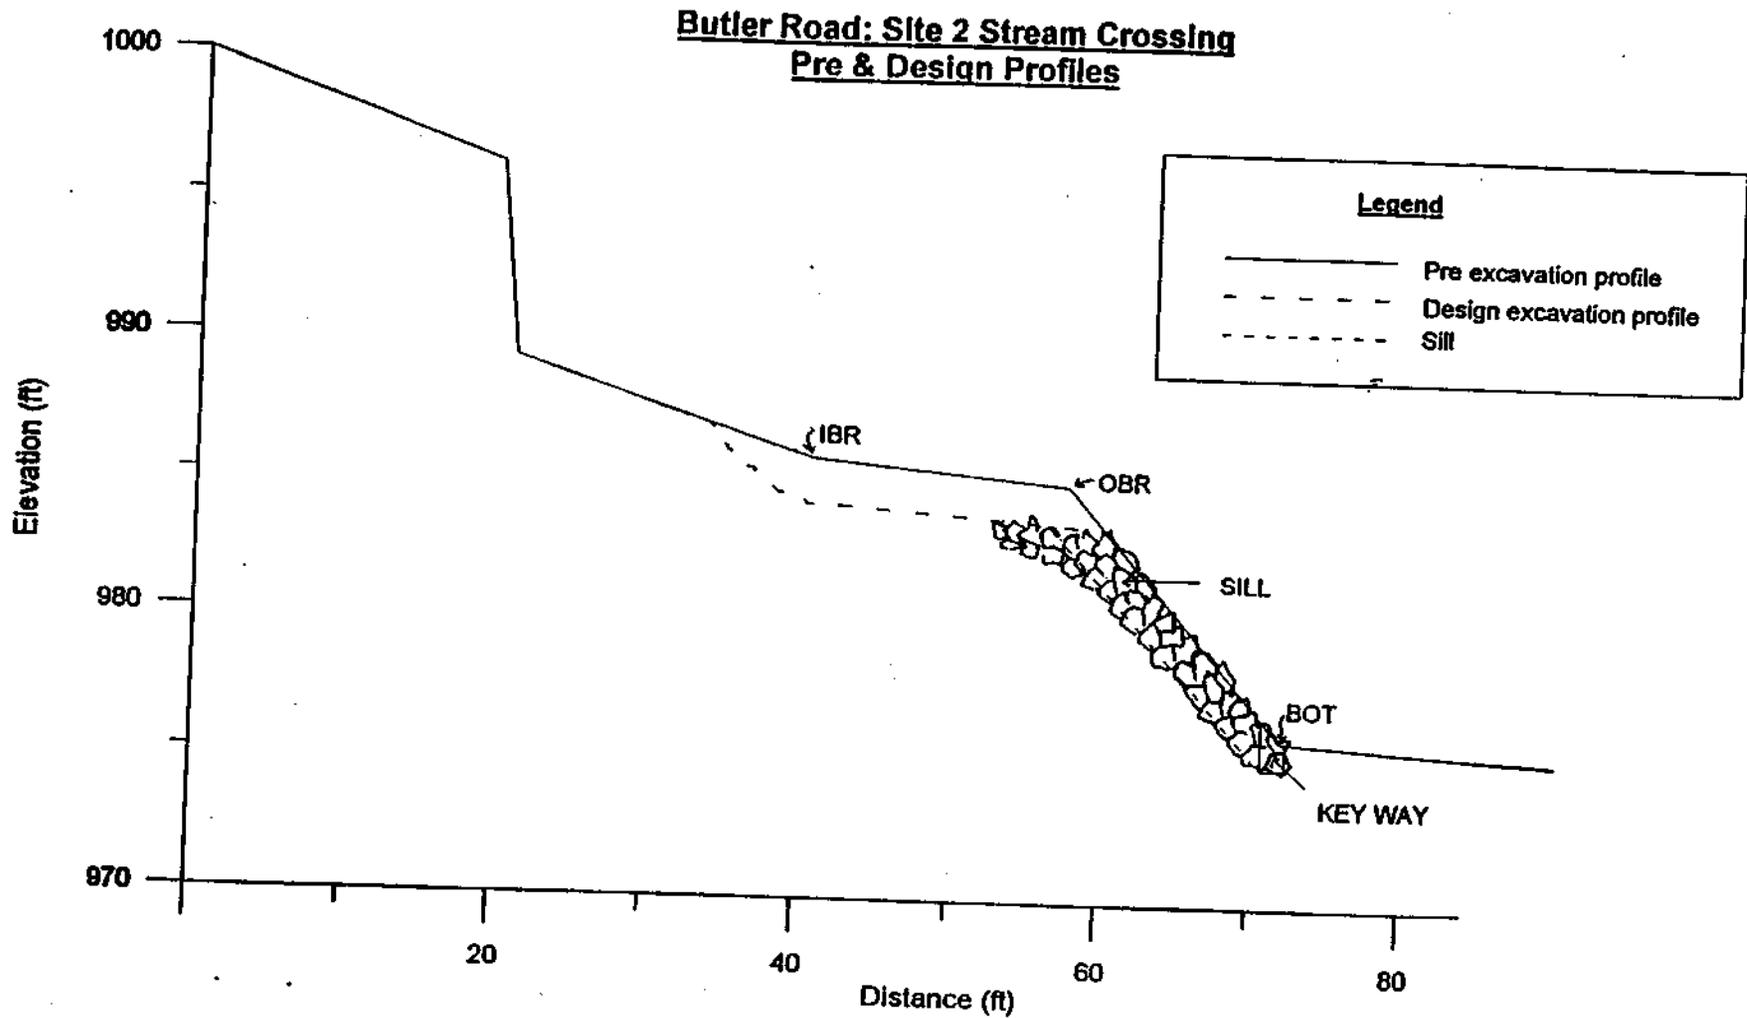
Butler Road: Site 2 Stream Crossing Pre & Design Excavation Profiles.
